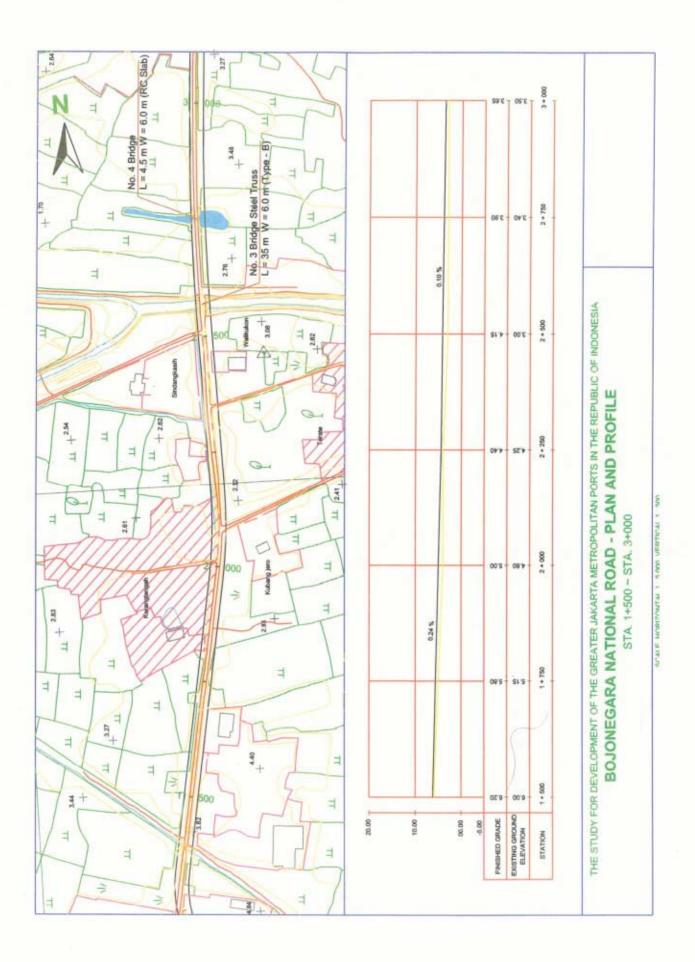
C-12 Bojonegara National Road Plan and Profile (7)
